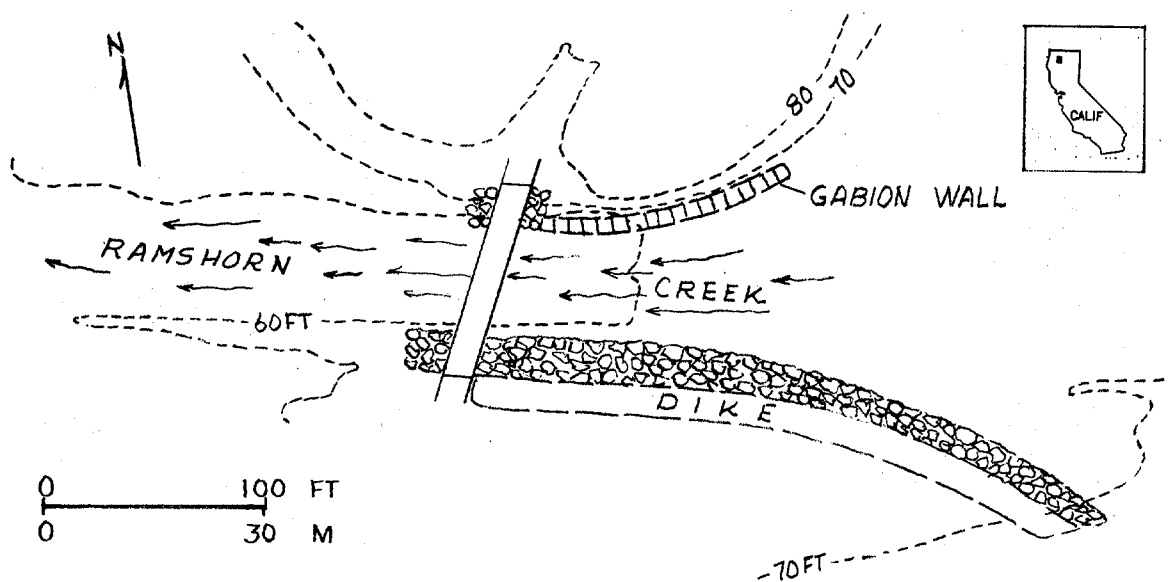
Plan showing countermeasures at Ramshorn Creek.
